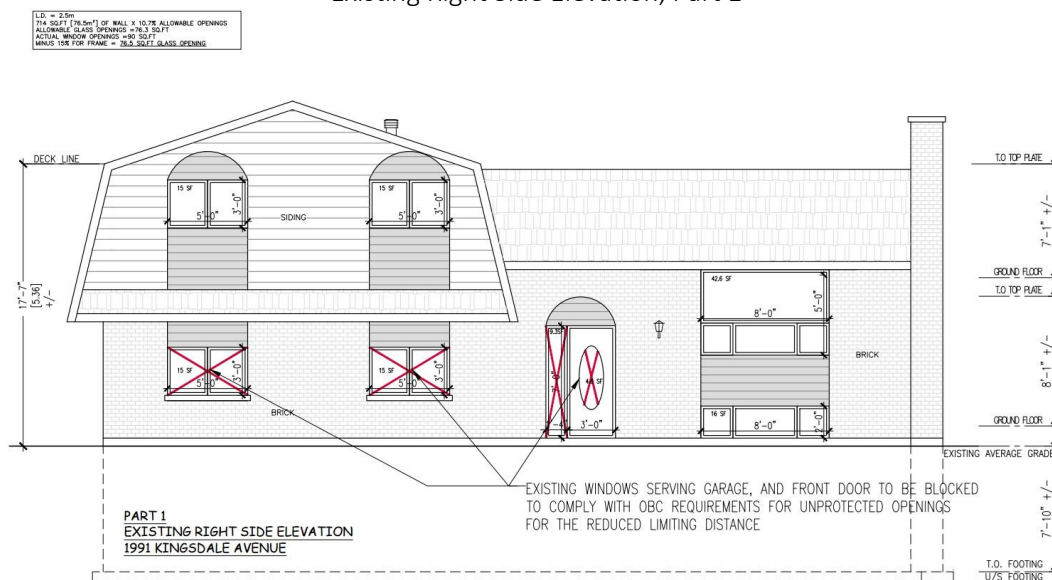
EXISTING RIGHT SIDE ELEVATION
